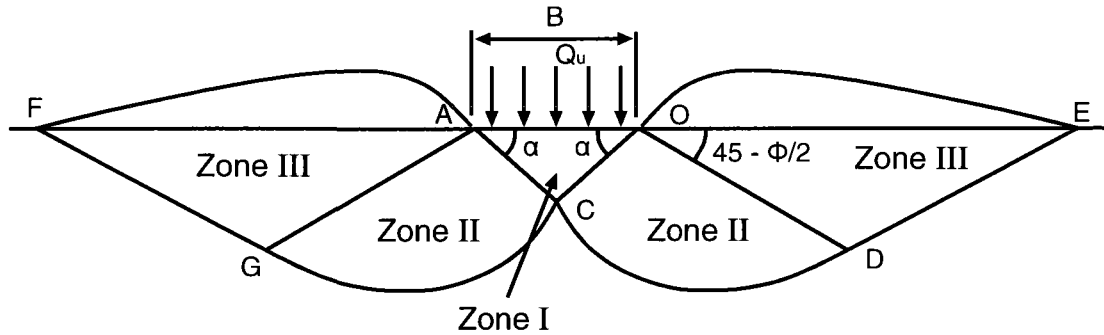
Bearing capacity failure in soil under a rough rigid continuous foundation (modified after Terzaghi 1943)
